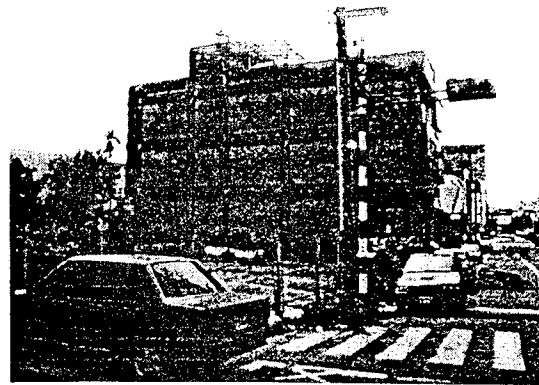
Typical low-rise building (Fengyuan City, Taichun County)
